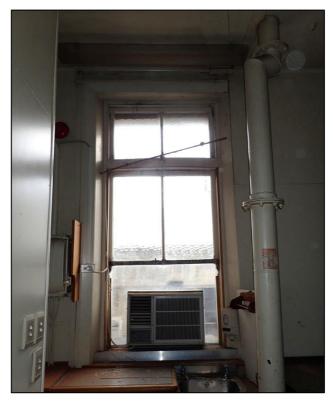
This modified sash window in the west wall of Room 2 appears to be an original feature.
